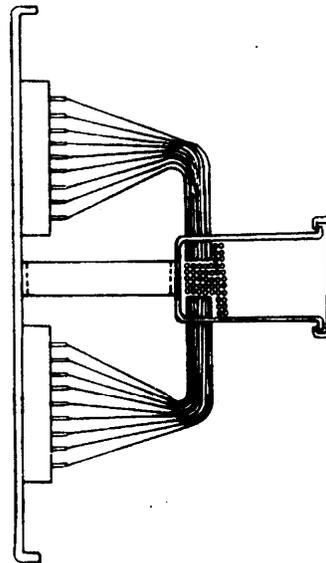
Cabling Trafficorder Patch Panels or Similar Equipment.
